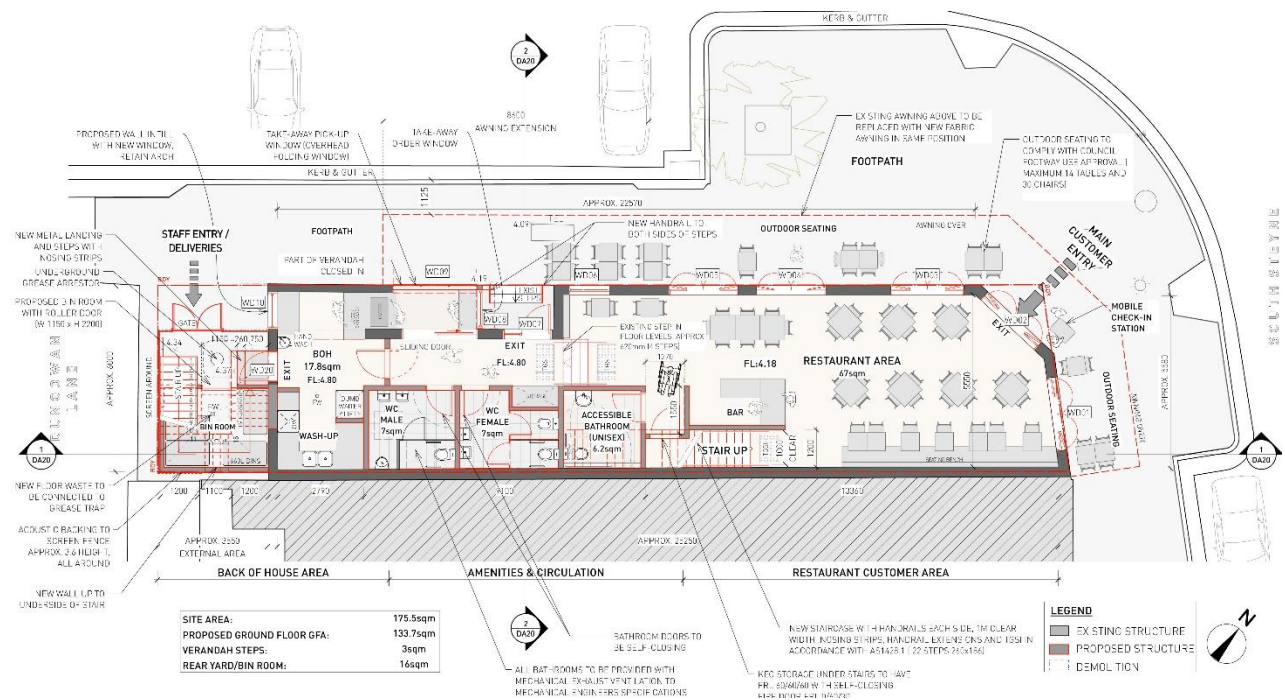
Proposed alterations and uses to the Ground Floor. See Drawing DA10
